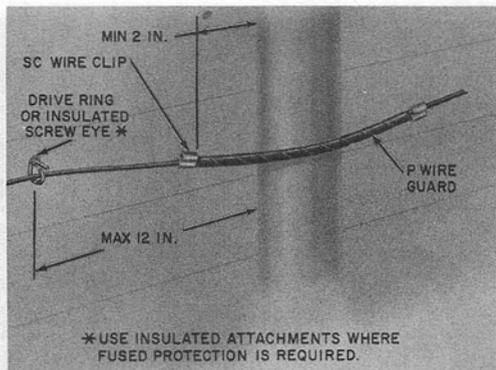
Wires Crossing Downspout on Wood, Stucco, or Metal Surfaces
